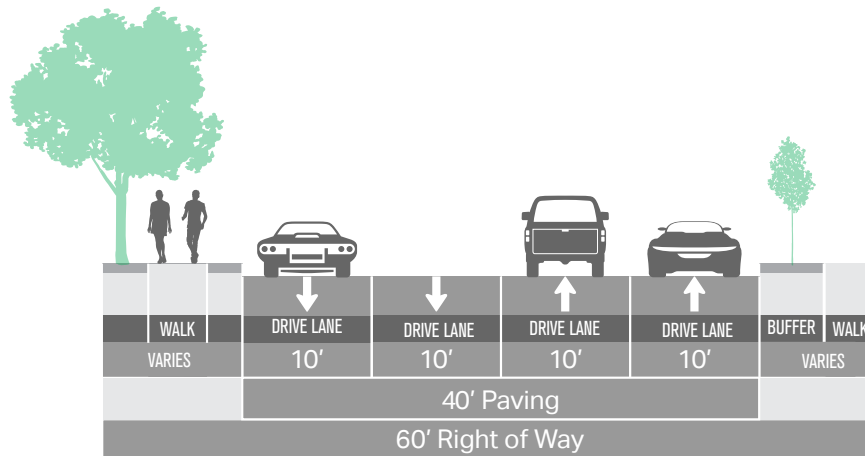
Existing Typical Sawyer Street Section: South of Washington Avenue
